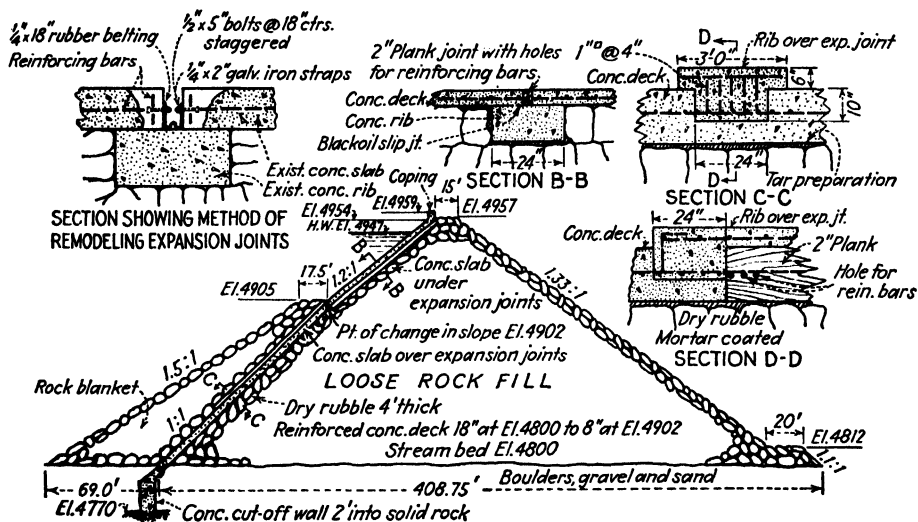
Section and joint details. Swift Dam, The Valier-Montana Land and Water Company, Montana.
